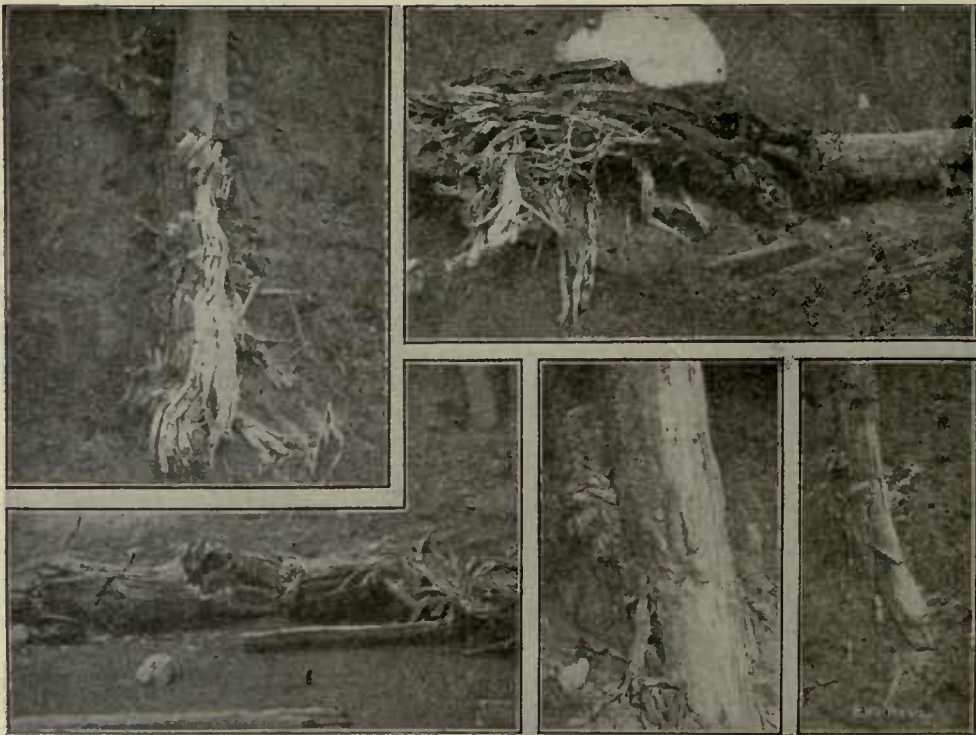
FIVE EXAMPLES OF OVER-DRIVEN PILES.
